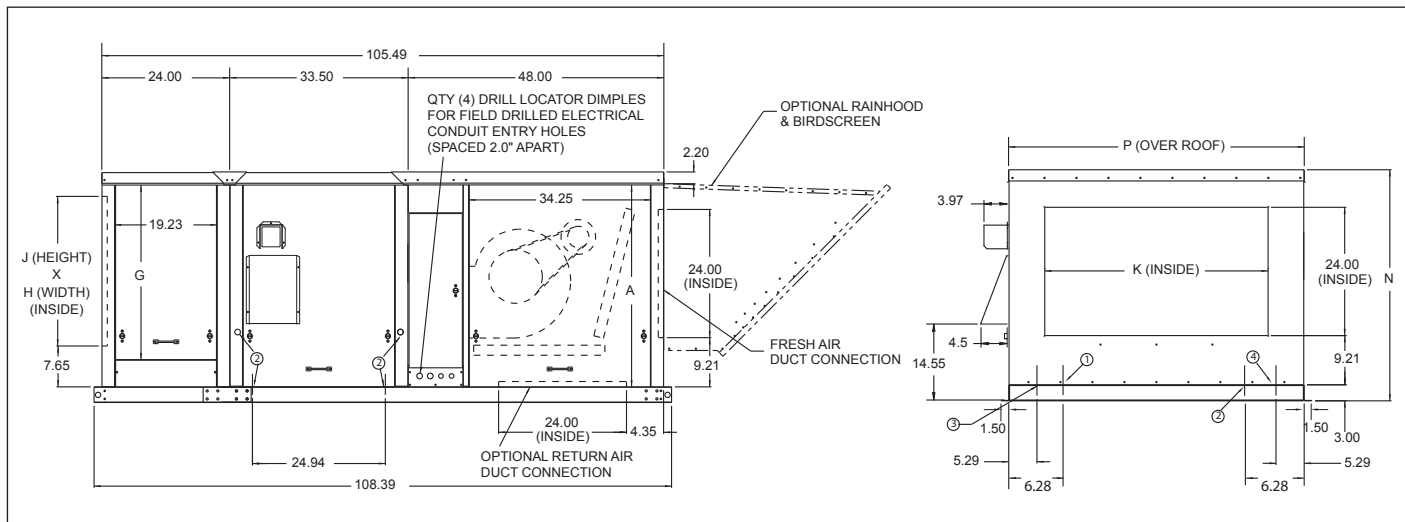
HPP Outdoor STANDARD BLOWER Cooling & Downturn Packaged Unit Dimensions
